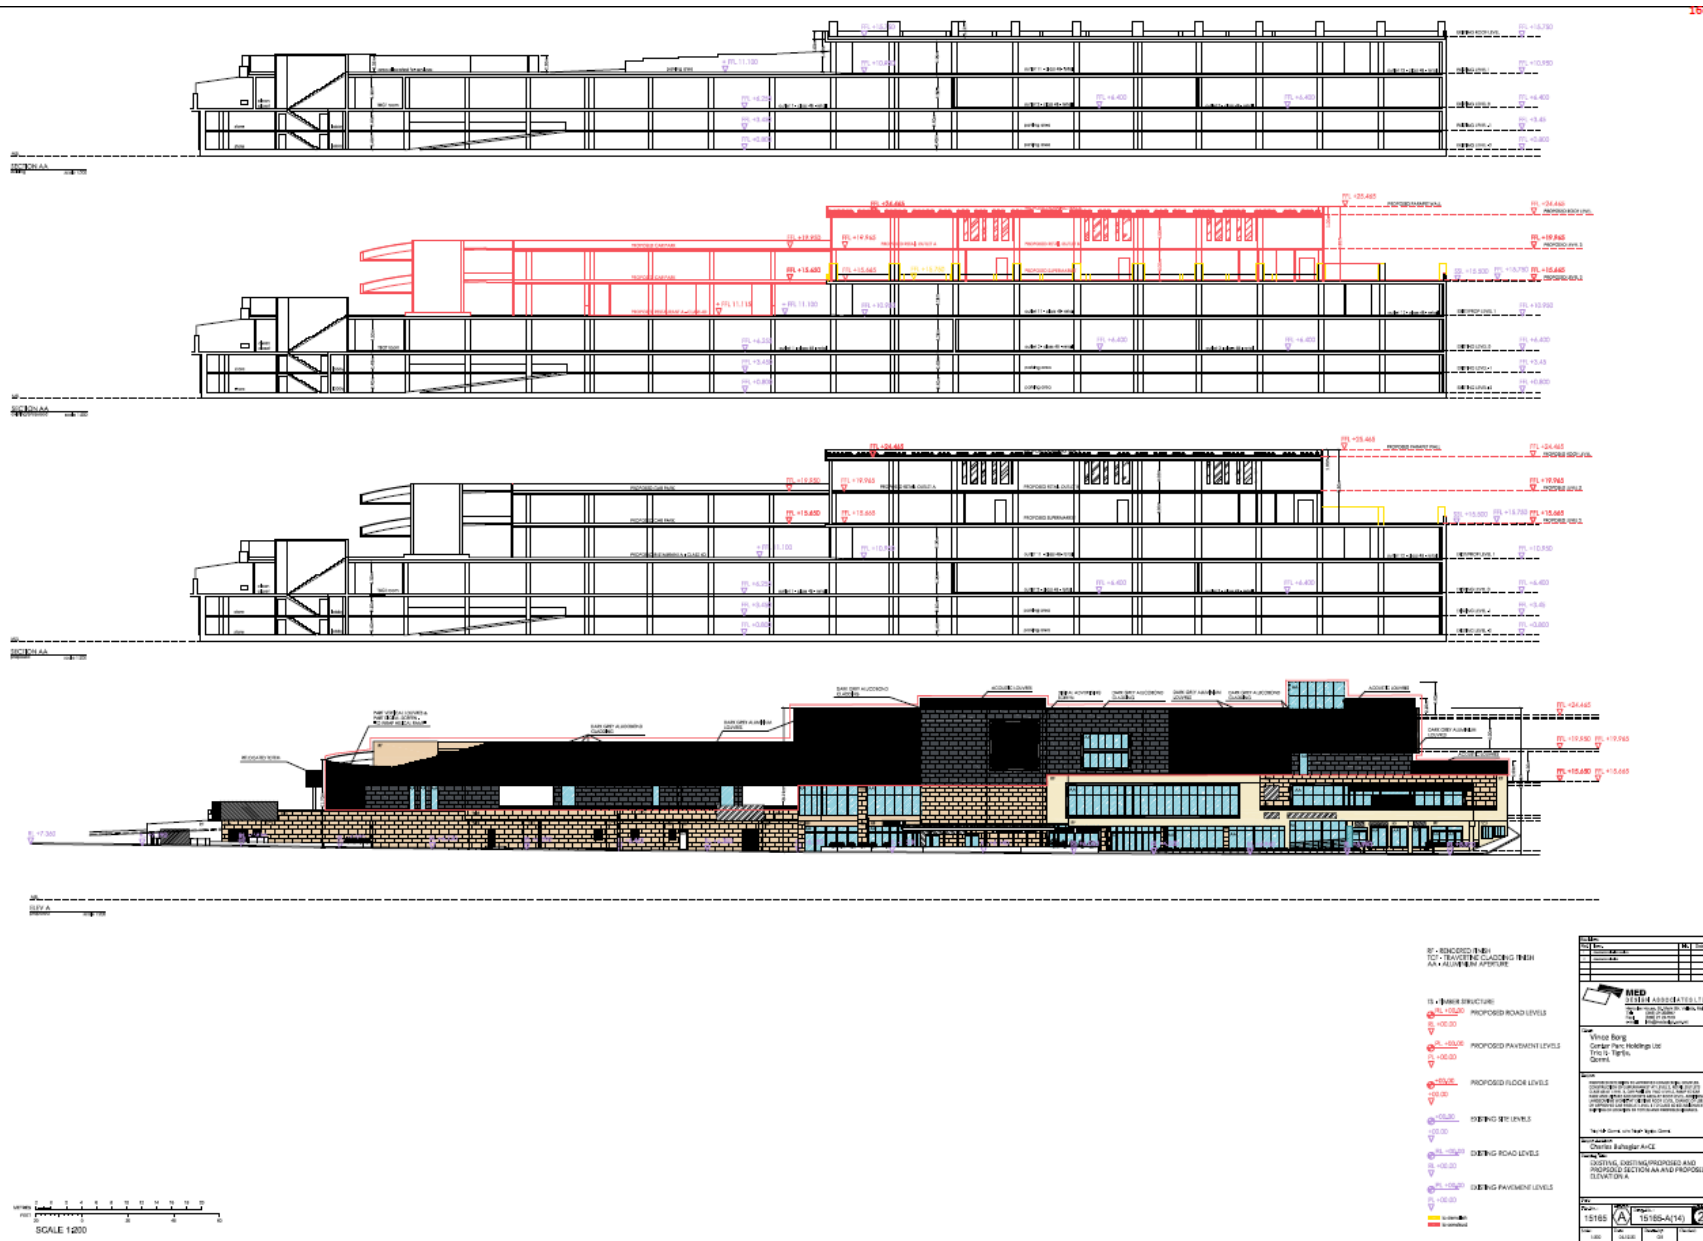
Sections and elevations of the existing and proposed development. Source: E-Apps PA 08866/20/Doc 16o.
